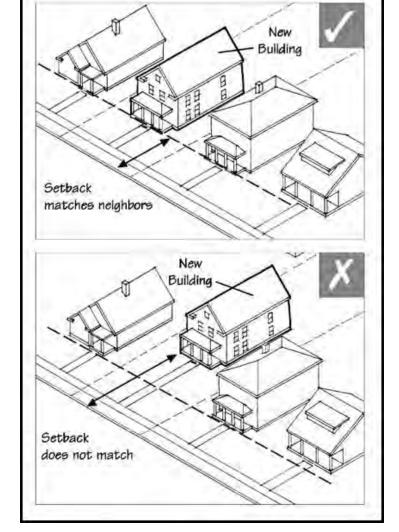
(Right) This diagram illustrates contextual setbacks, which align with adjacent structures. Mis-matched setbacks should be avoided.
